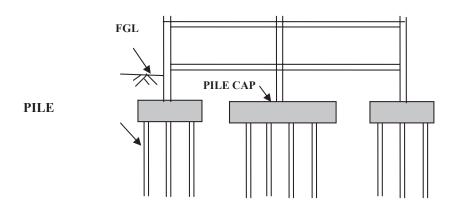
Schematic diagram of pile foundation used for the construction of Nargis Memorial Clinic Building
